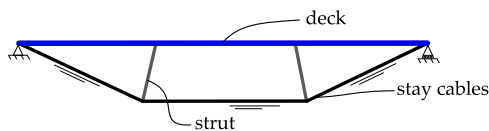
Elevation of a single-span UDCSB with two struts in conjunction with the main elements: deck, stay cables and struts.
